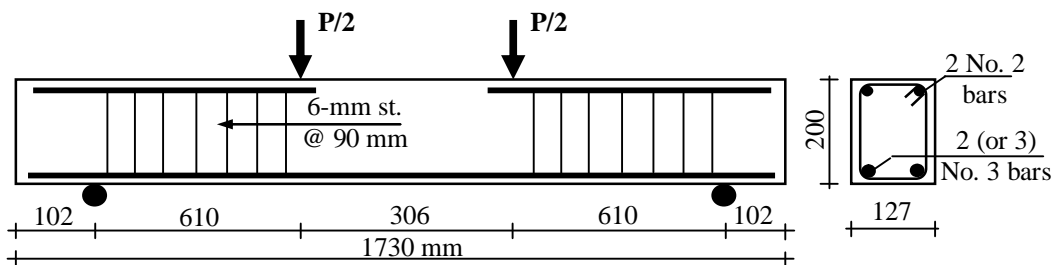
Dimensions and Reinforcement Details of Test Specimen
